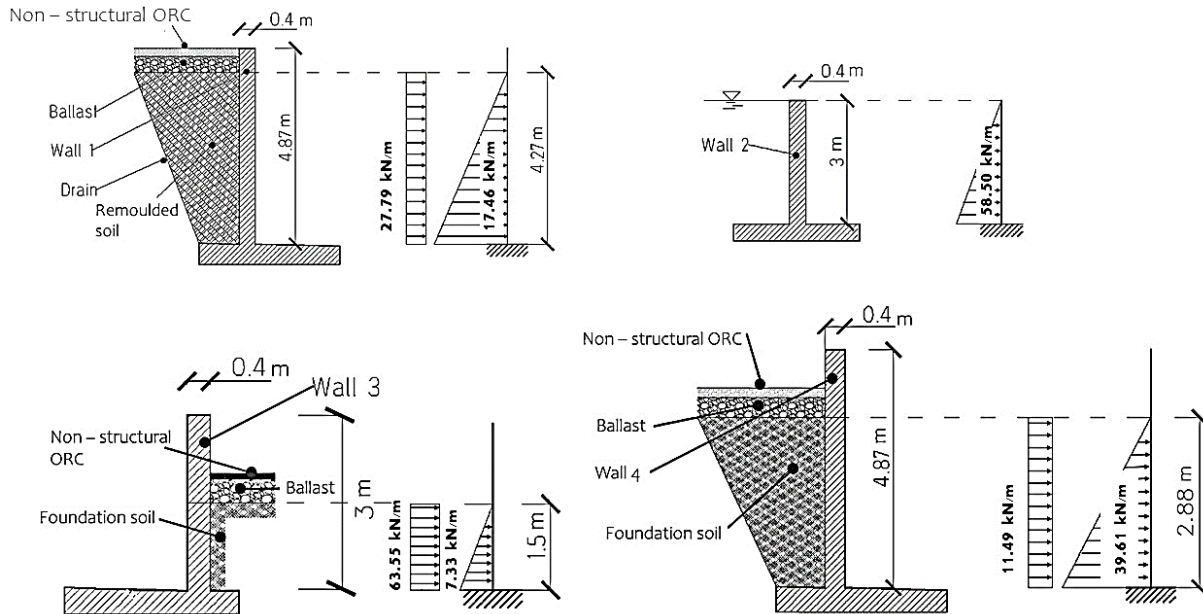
Representation of the structure and of the related structural design models for Wall 1 and Wall 2 (top part, left and right side respectively) and Wall 3 and Wall 4 (bottom part, left and right side respectively). While a triangular distribution has been assumed for the soil and for the water, a rectangular one has been employed for the other actions. An average loaded portion between Wall 1 and Wall 3 has been considered for Wall 4, due to the fact that its height passes from 4.87 m to 3 m.
